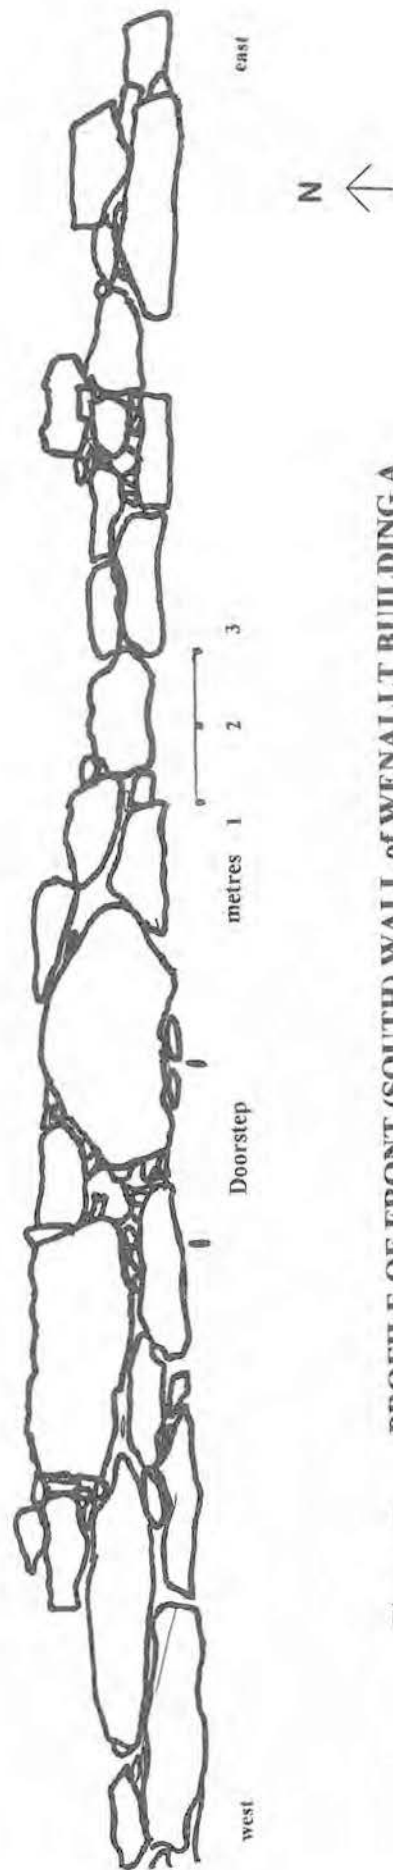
PROFILE OF FRONT (SOUTH) WALL of WENALLT BUILDING A
